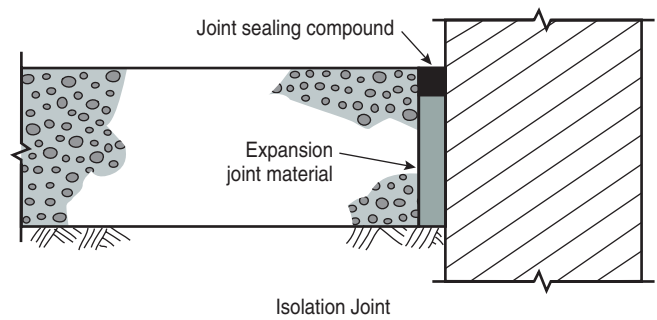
Isolation joints permit horizontal and vertical movements between abutting faces of a slab and fixed parts of a structure.
